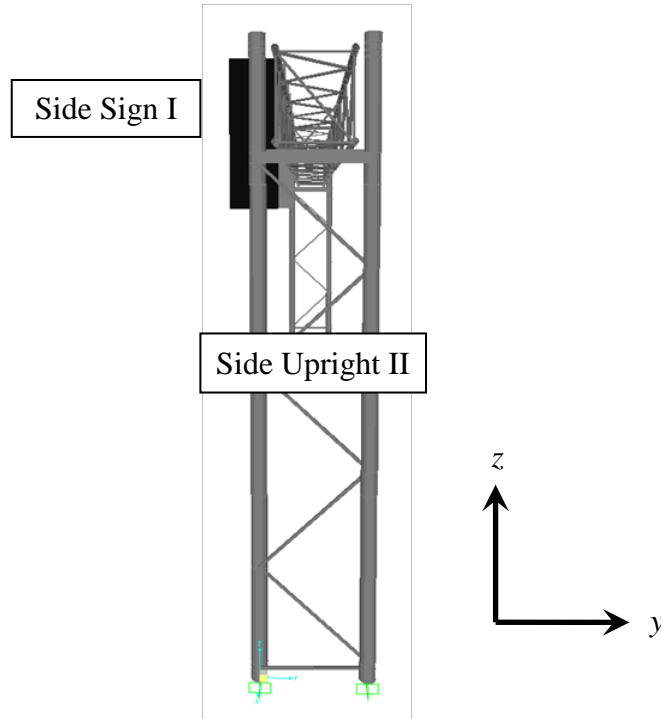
Area breakdown of the West side face of the bridge-type VMS support structure
